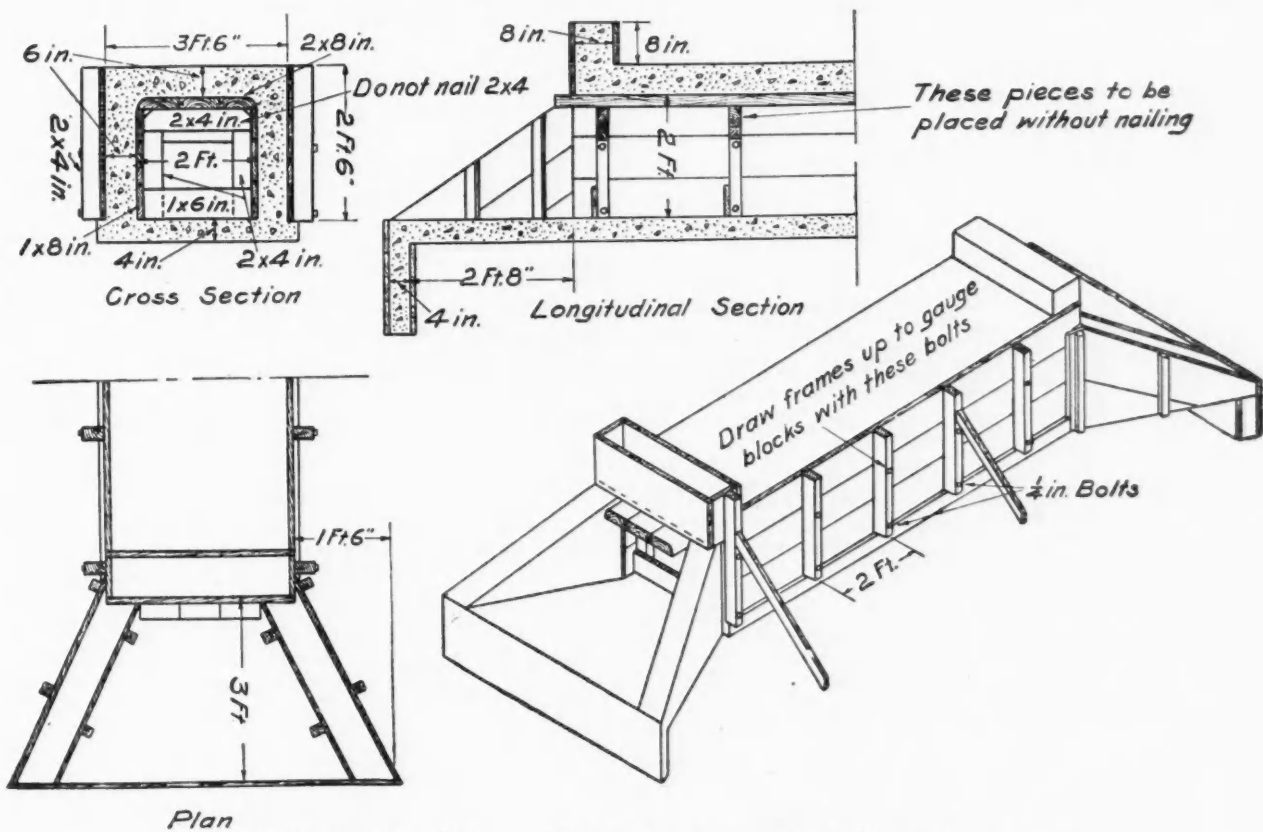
Standard Type of Form and Culvert Used by Iowa State Highway Commission
